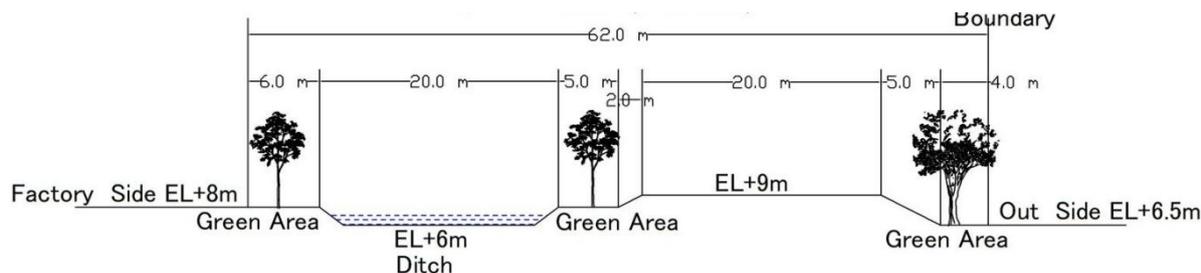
Standard Cross Section of Dike (Sea Side)
